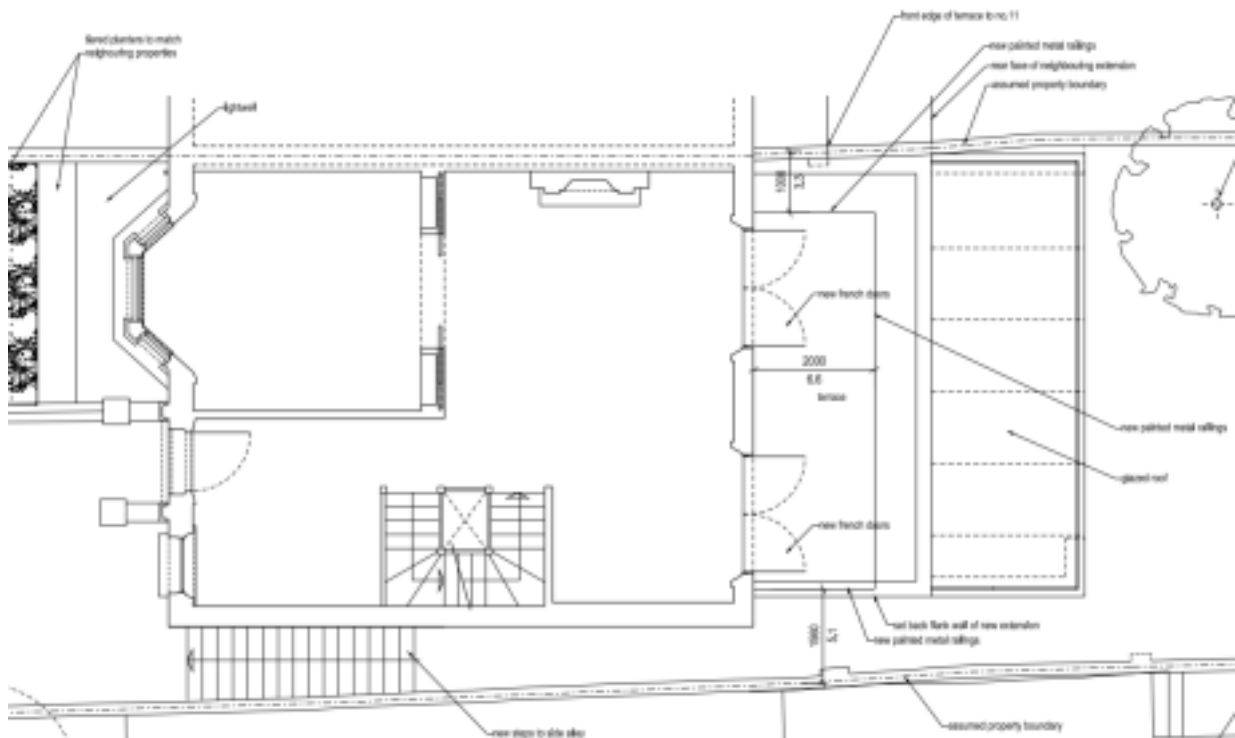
The upper ground floor plan of the application 2016/1295/P shows the approval of a roof terrace for the B Plain of 17 Nassington Road.
